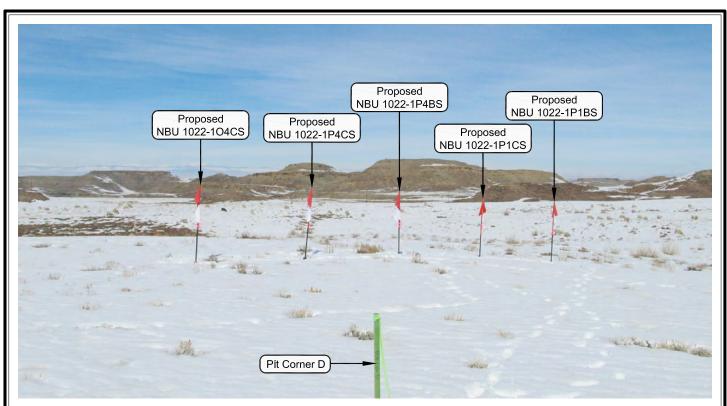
PHOTO VIEW: FROM PIT CORNER D TO LOCATION STAKE
